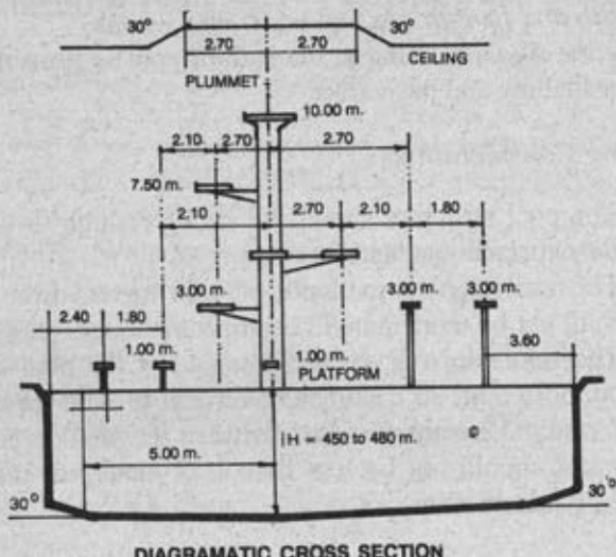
SWIMMING POOL MINIMUM DIMENSIONS
